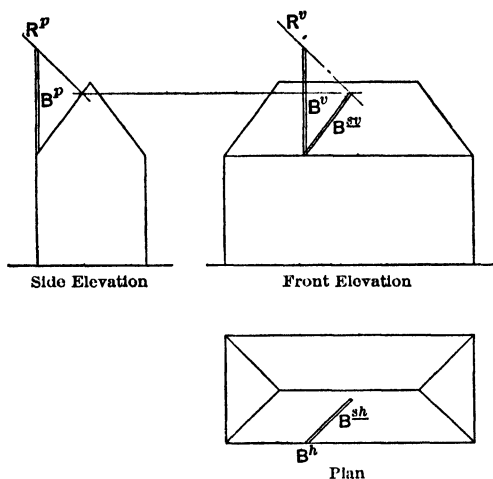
The Shadow of a Vertical Line upon a Roof Plane
